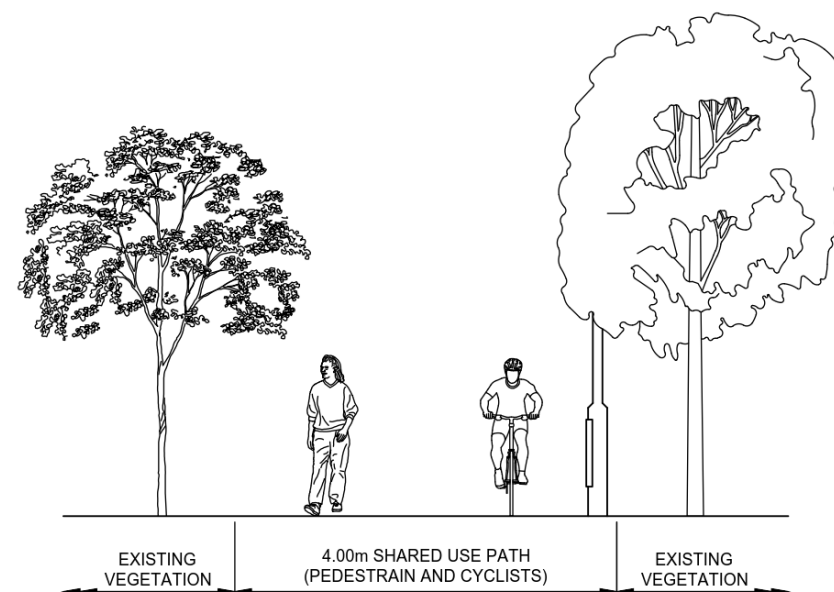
Cross Section Route 4 – Wallyford Railway Station Car Park to Crookston Road; Existing Informal Path adjacent to Wedderburn Terrace to Ferguson Drive; Monktonhall Place to Newcraighall Road
